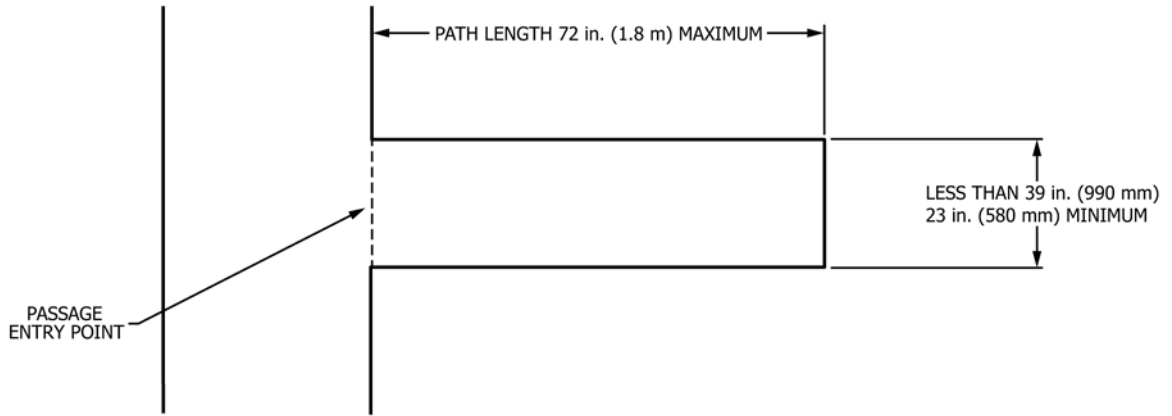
Dead Ends With Less Than 39 in. (990 mm) Cross Section Without Turnaround Overhead View
